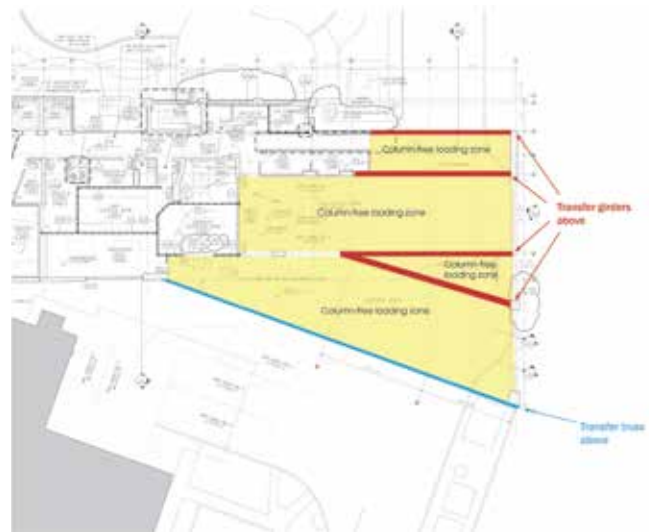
Drawing indicating four PT transfer girders and 120 ft (37 m) PT concrete truss.
